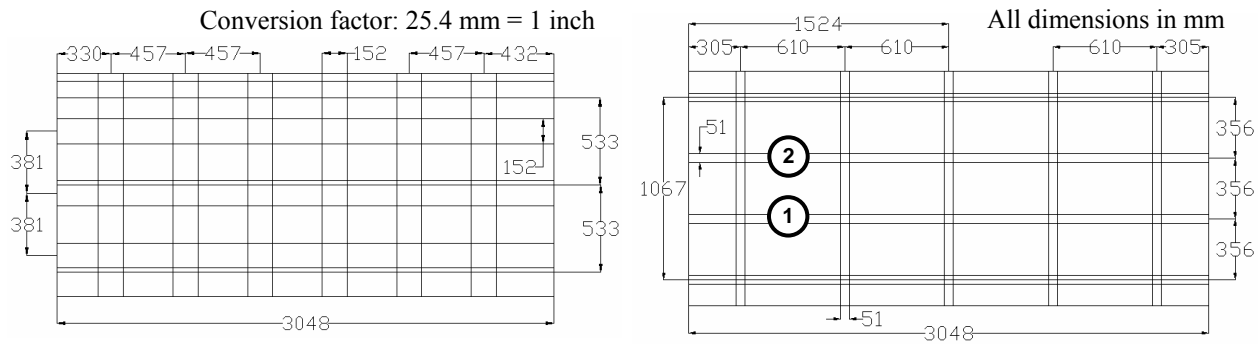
Strengthening scheme in test specimens S2 and S3
